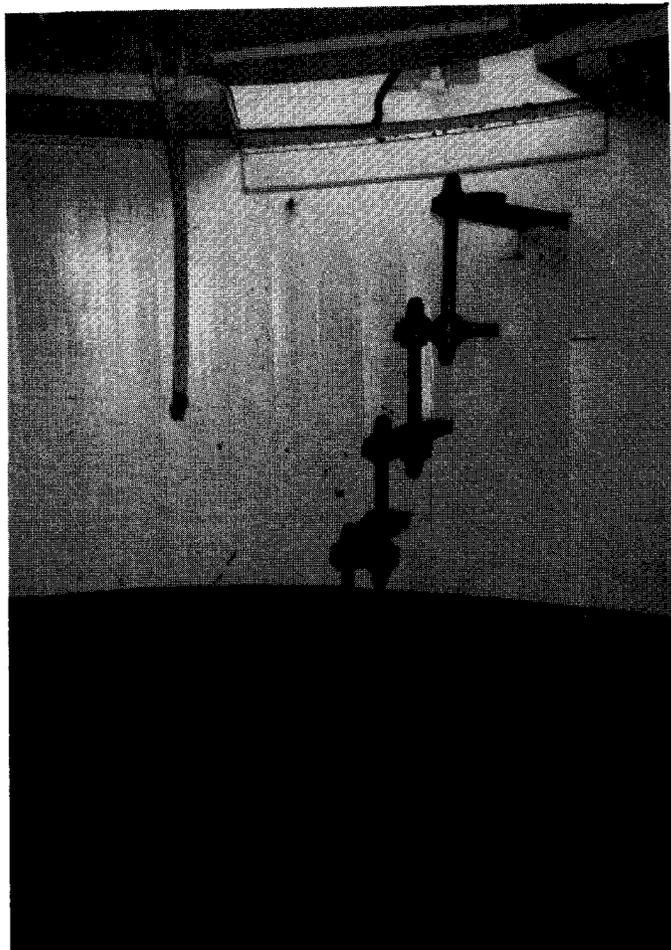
Room 112, stair on west wall of Watch Deck ascending to Lantern Deck.
